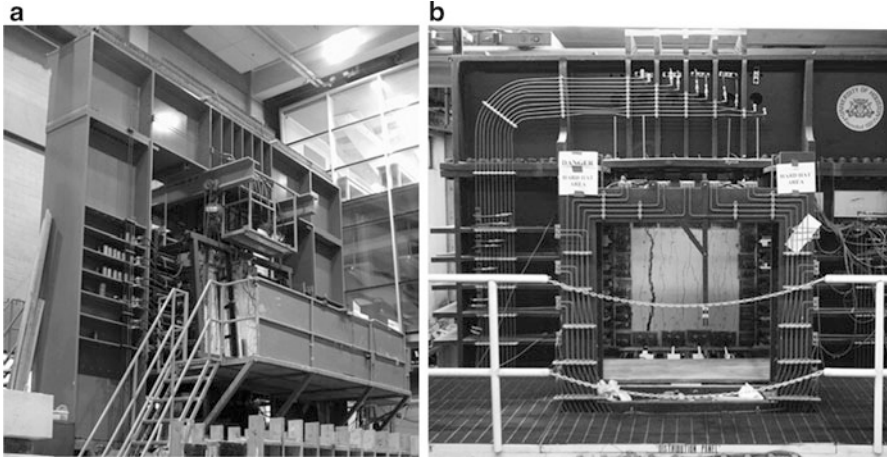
Reinforced concrete panel test facilities: (a) shell element tester at University of Toronto, (b) universal element tested at University of Houston
